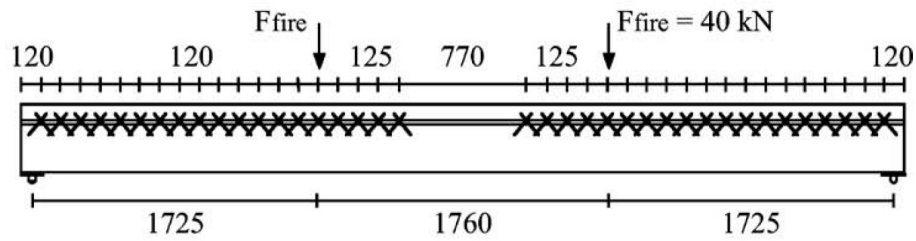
Longitudinal section of the timber-concrete composite slab tested under ISO fire exposure
